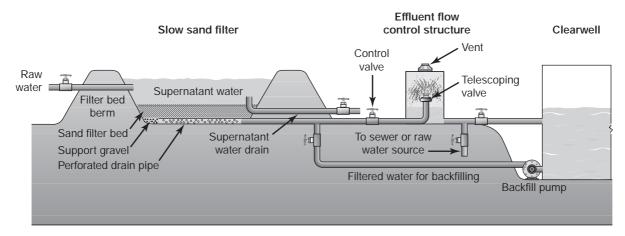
Typical un-housed slow sand filter installation (Source: U.S. EPA, 1992).
